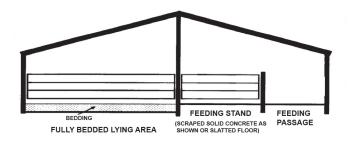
bedded house with concrete feeding stand.
